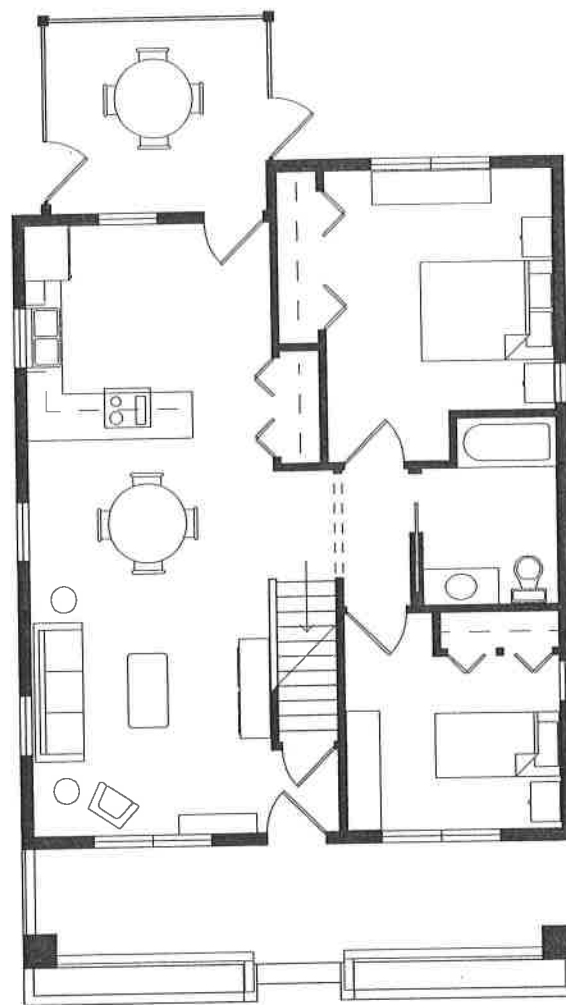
Home plan for aging in place. This plan has no-step entries at the front and rear. It has first-floor bedrooms, kitchen, and laundry facilities, and the tub can be easily replaced with a roll-in shower if needed. This home has a first-floor interior footprint of only 930 square feet, which demonstrates that homes can be small and affordable while still allowing aging in place.
